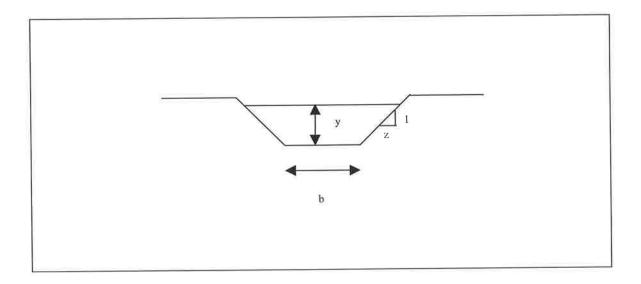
Trapezoidal Channel Cross Section, where b is the channel width, y is the depth of flow and 1/z is the side slope of the channel
